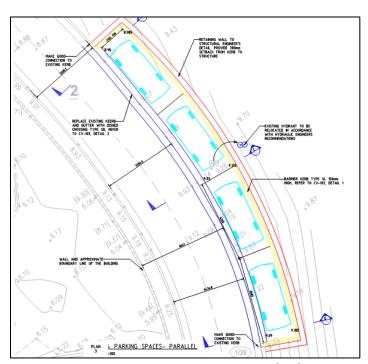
Parking Plan 2-4 Spaces (Stellen, 7/04/2021)
